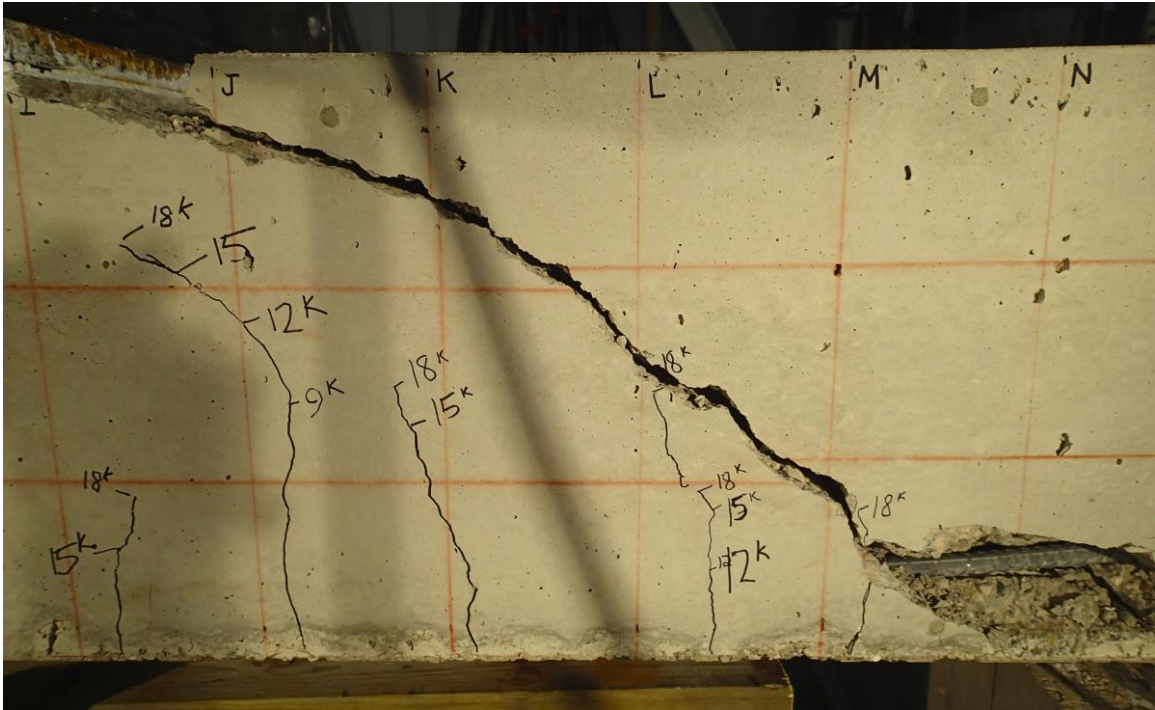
Specimen F-3: South Side Failure Inclined Crack
